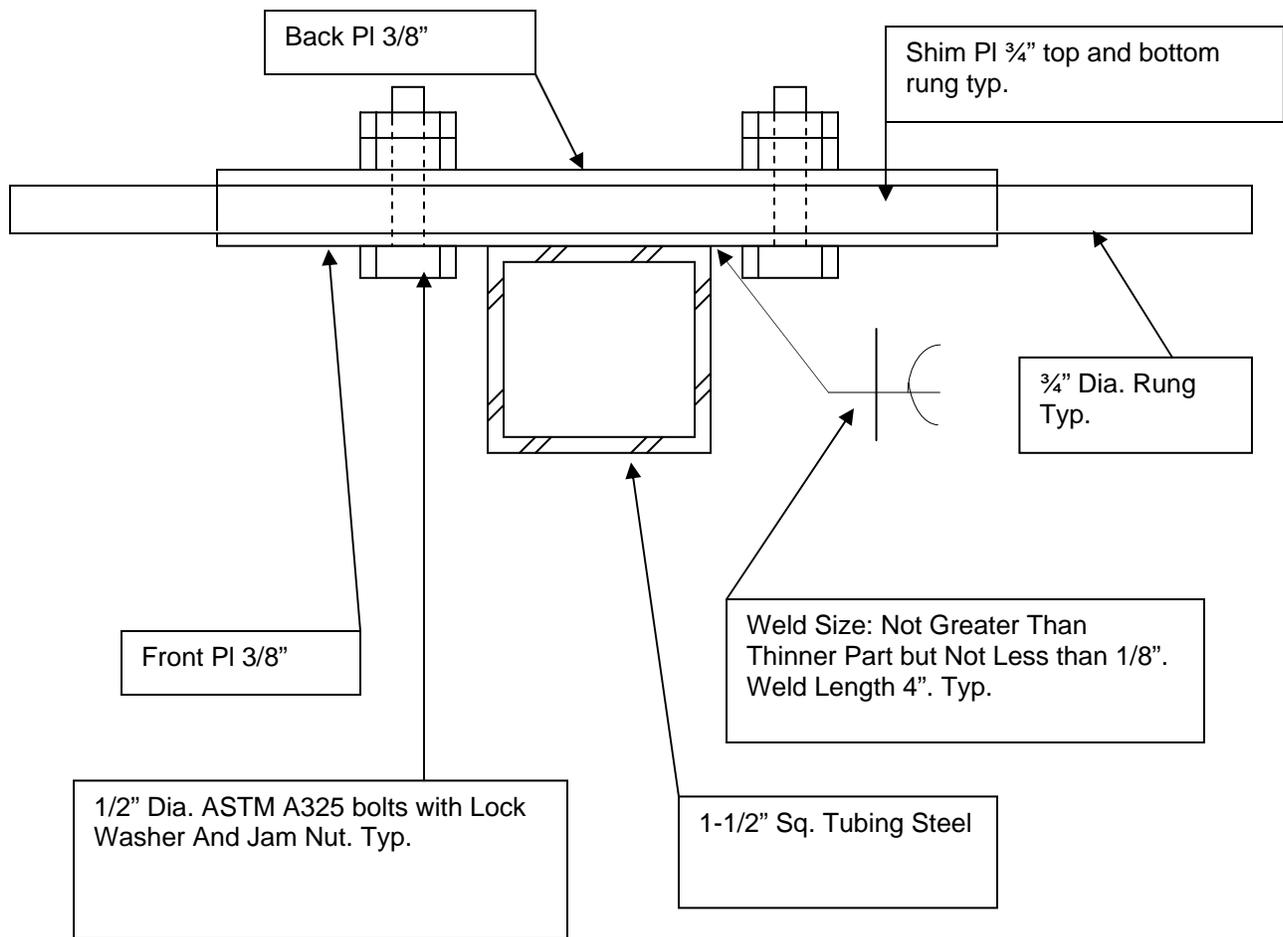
, Typical Connection Modification of Tubing Steel of Top Bracket Assembly (not to scale)
